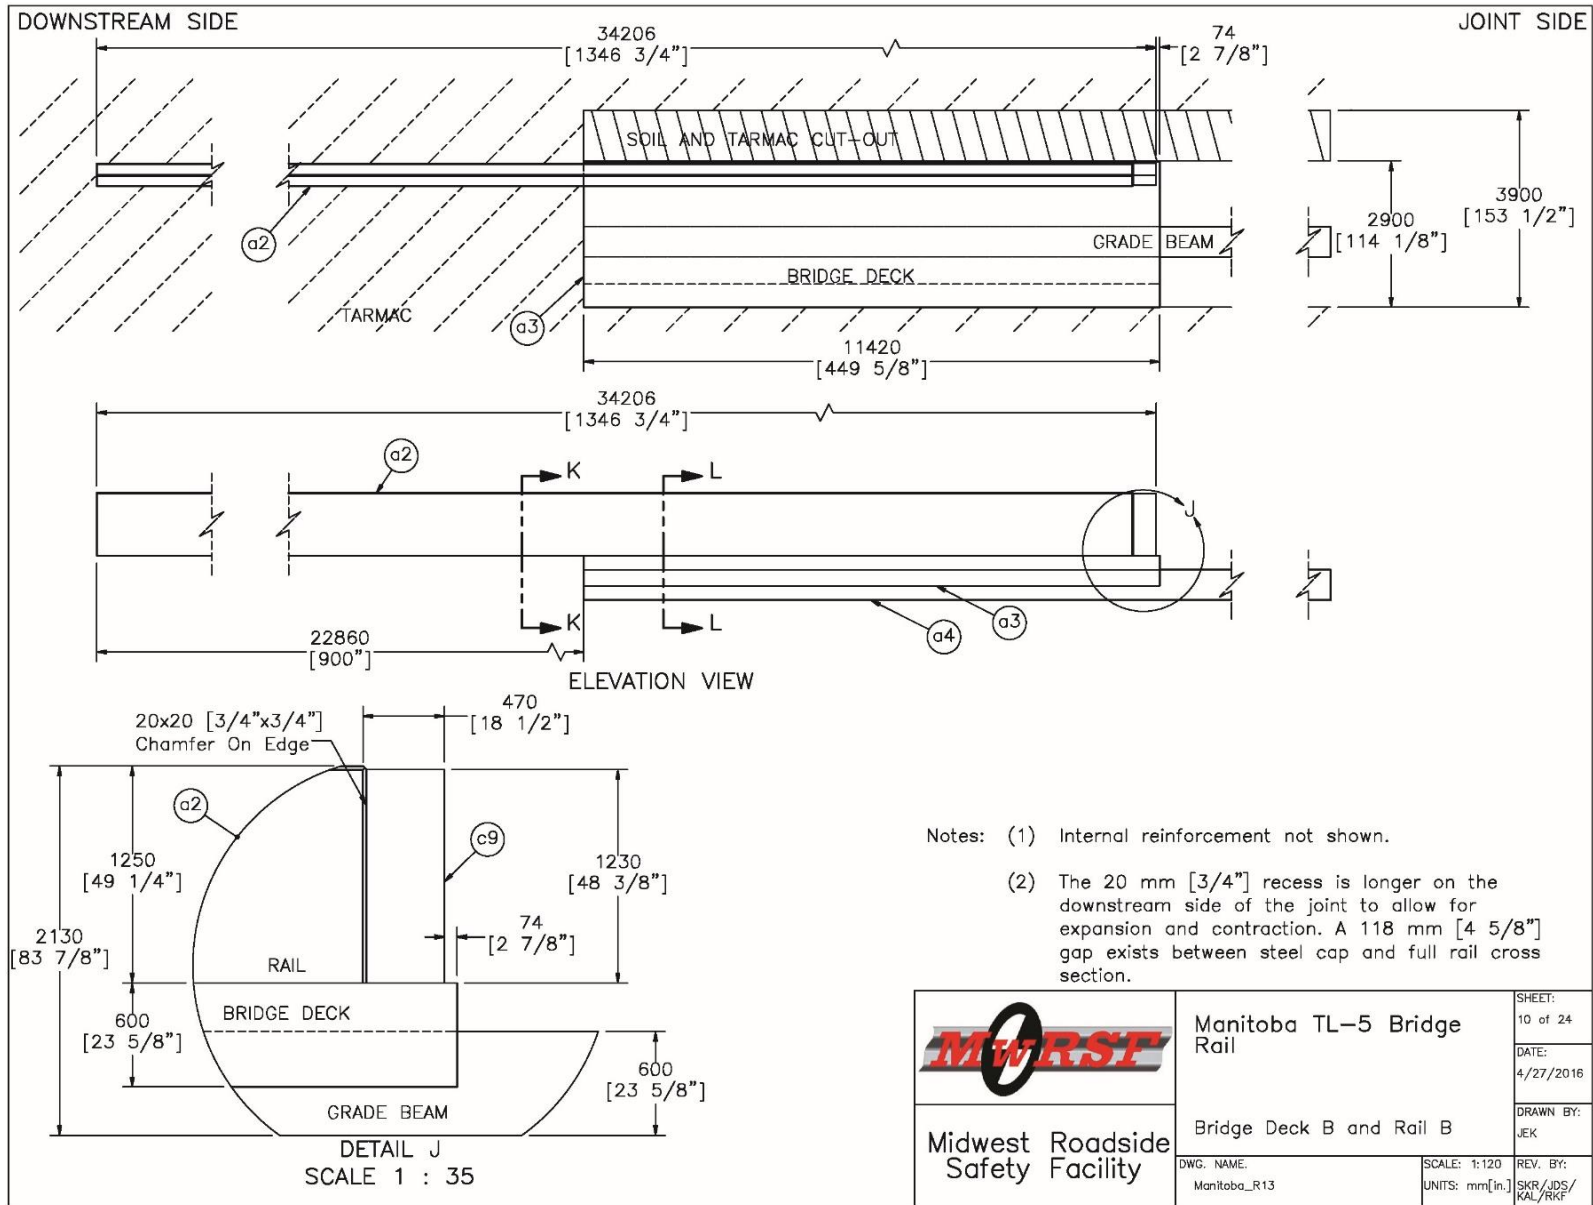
Bridge Deck B and Rail B, Test No. MAN-1
